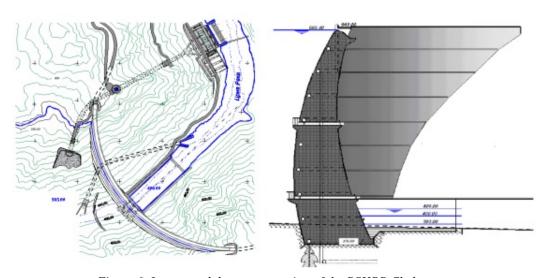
Layout and dam cross section of the PSHPP Chebren.
